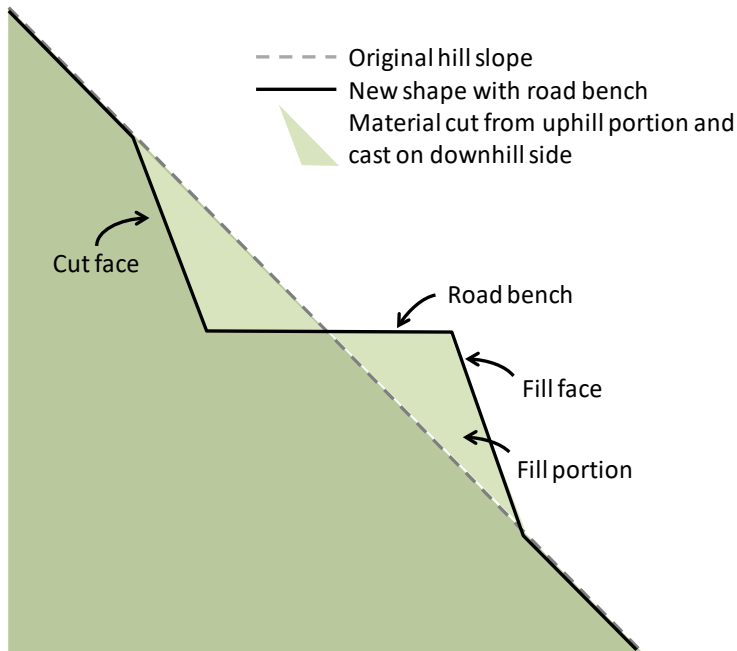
CROSS SECTION OF TYPICAL (IDEALIZED) SIDECAST CONSTRUCTION TECHNIQUE.
